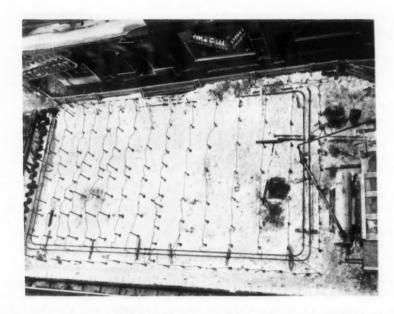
FREEZING PIPE FIELD JUST PRIOR TO STARTING REFRIGERATION.
